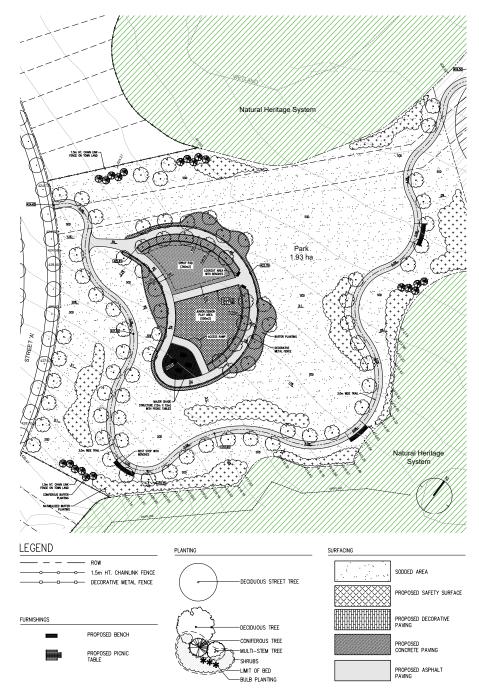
Proposed Facility Fit Plan for Neighbourhood Park
